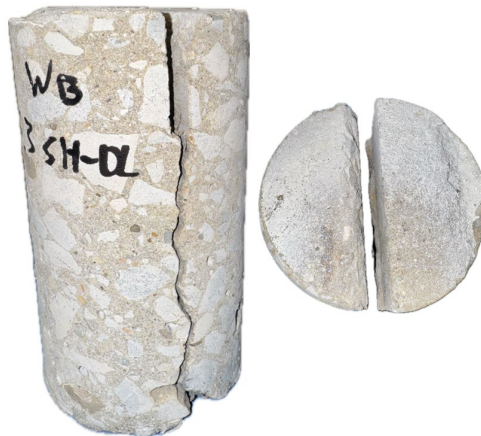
Photo. Test No. 7: side and top views of core extracted from I-72 WB at station 109+52 at the lane—shoulder joint.
